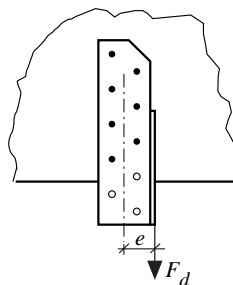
Tension load on a joist anchor. (STEP 1995 Article C13)
